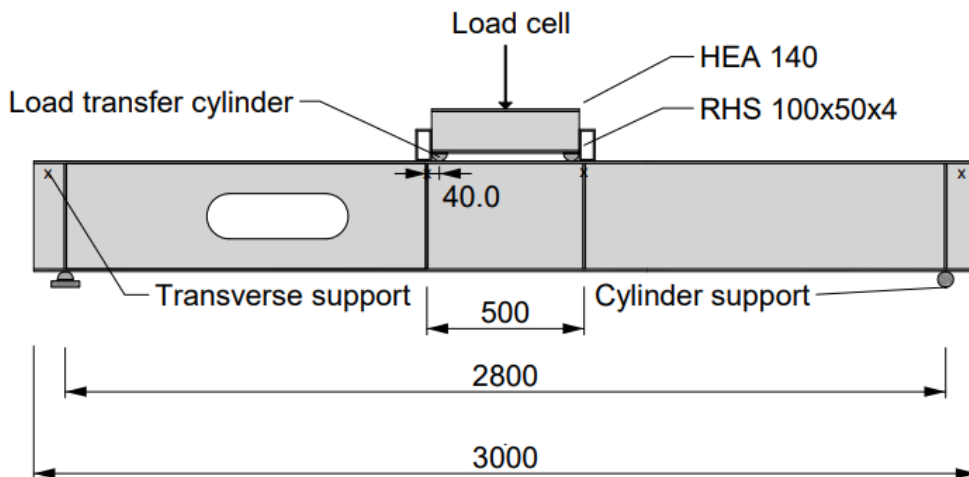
The experiment setup of specimen G with four-point bending. Dimensions are in mm.
